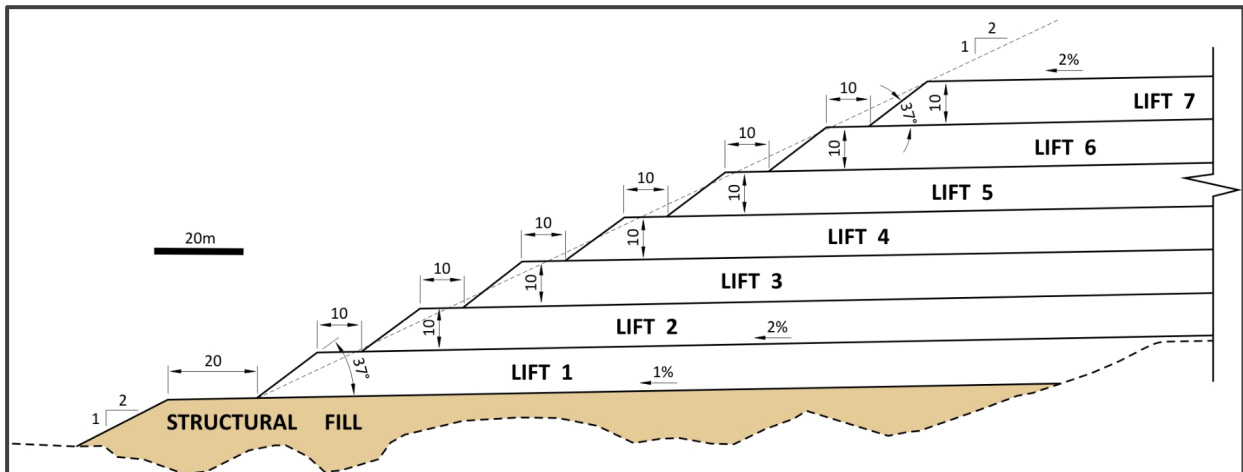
Heap Leach Arrangement of 7 Lifts – Stage 1 Cross Section
